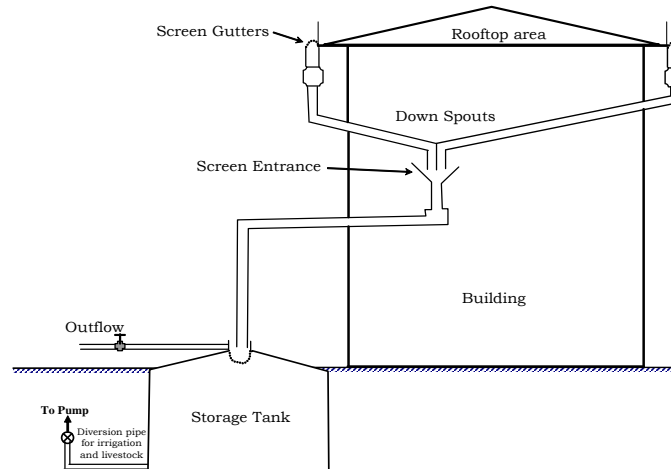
Schematic diagram of a typical rooftop rainwater harvesting structure (Sahoo and Bhatt, 2013)
